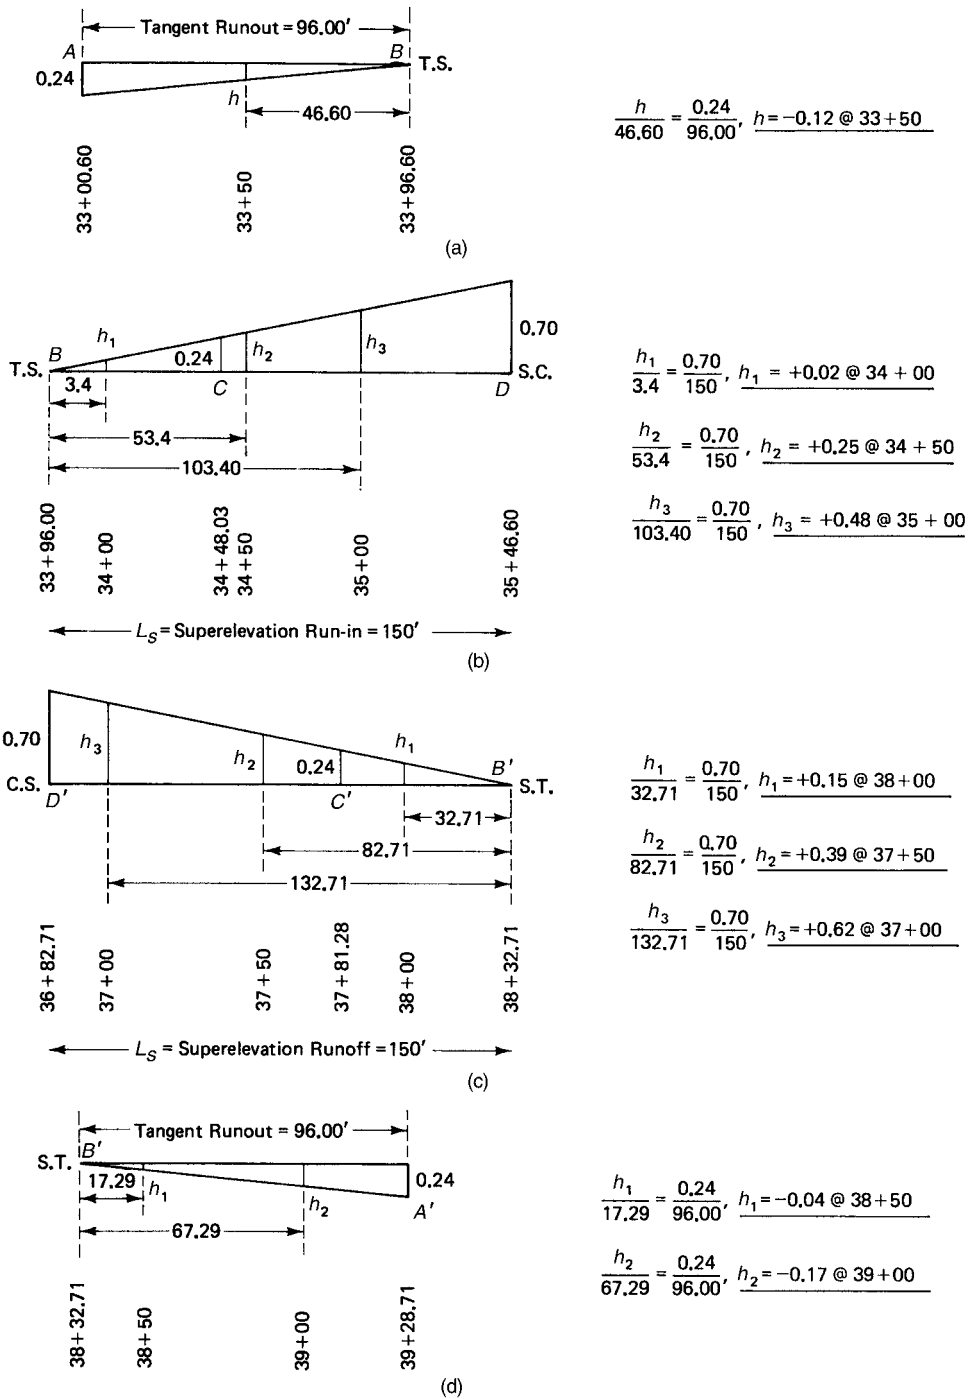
Left-edge pavement elevation interpolation for the problem of Example 11.9.
